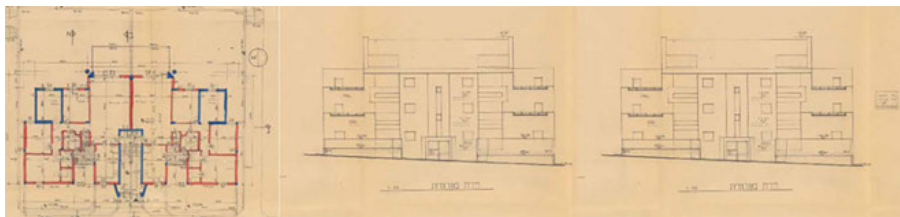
I-Shaped building, 1995. (Shoham Construction Committee archives)
